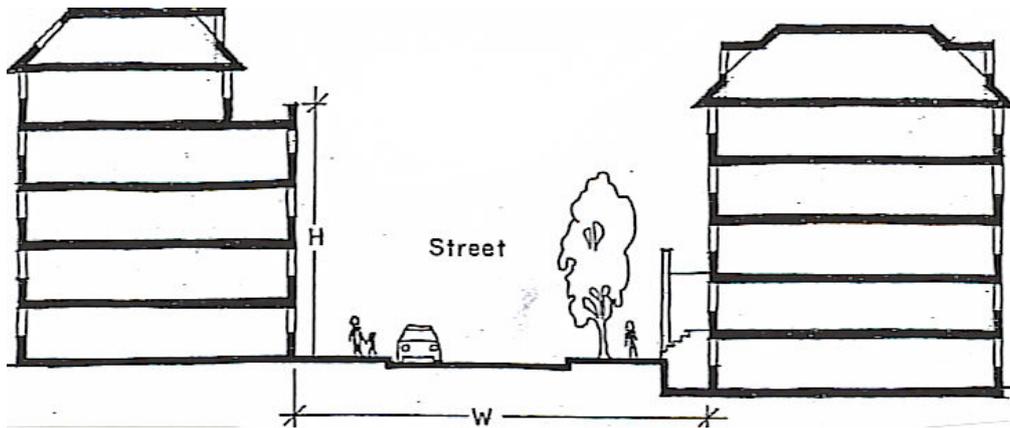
A ratio of building height to width of street is most comfortable at 1:1.5 or 1:2. If height is a concern accommodation can be located in the roofspace or basement or set back from the building frontage.
